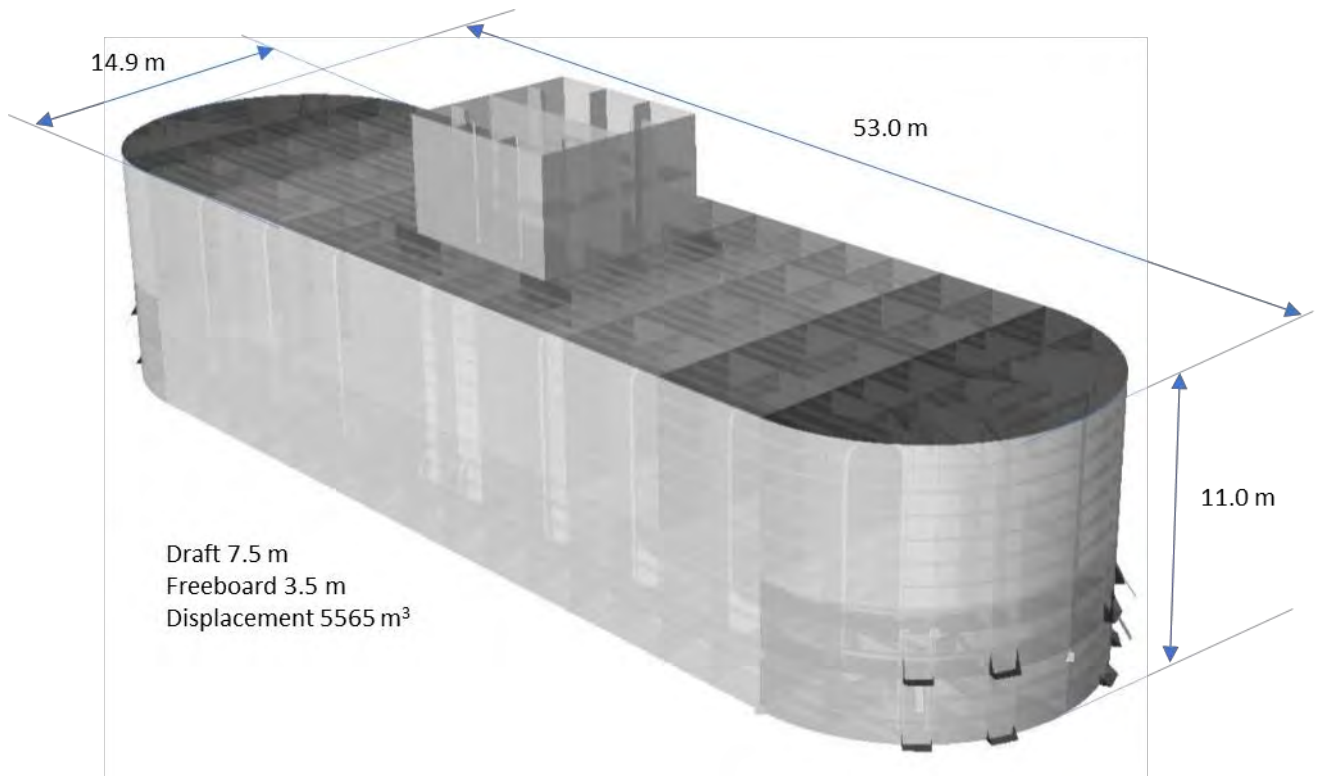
The geometric shape of pontoon with mooring lines. The inclination of top plate is not shown. The interface towards column is shown for illustration only.
